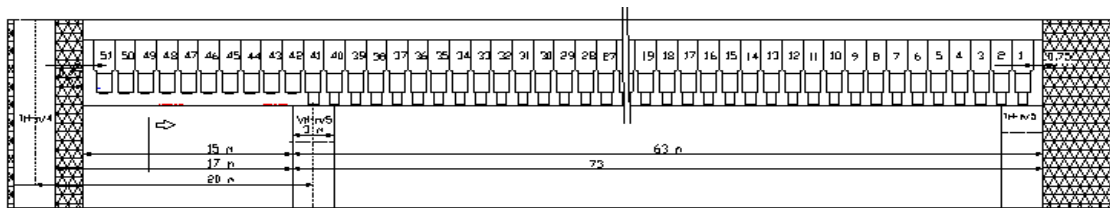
Geometry of the excavation unit with excavation of the protective pole
